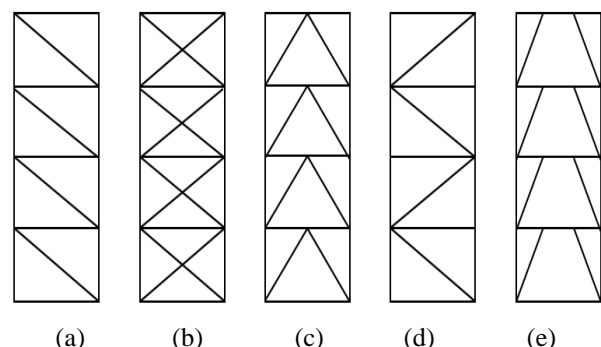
Types of bracings (a) Single diagonal bracing (b) X or cross bracings (c) V bracing (d) k bracing (e) knee bracing
